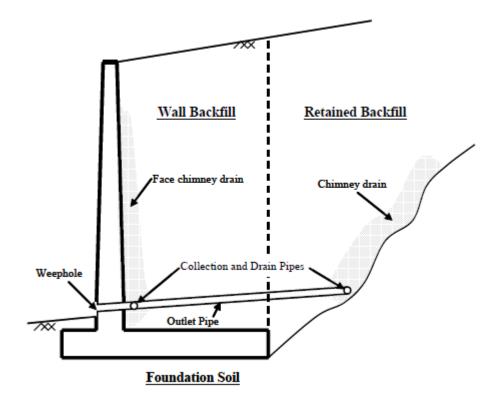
Concrete Cantilever Wall (FHWA NHI-07-071)
